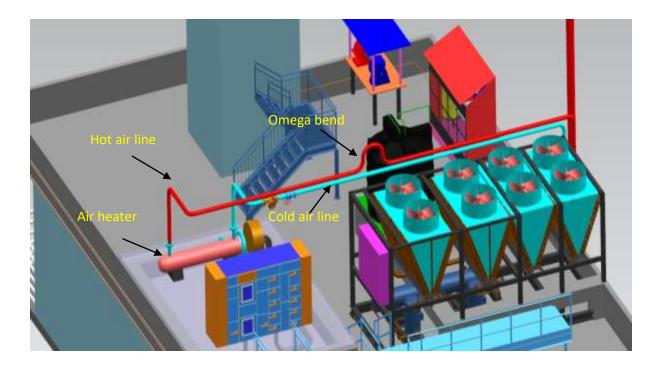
Top view of the terrace of the building, showing the heater pipe line connections
